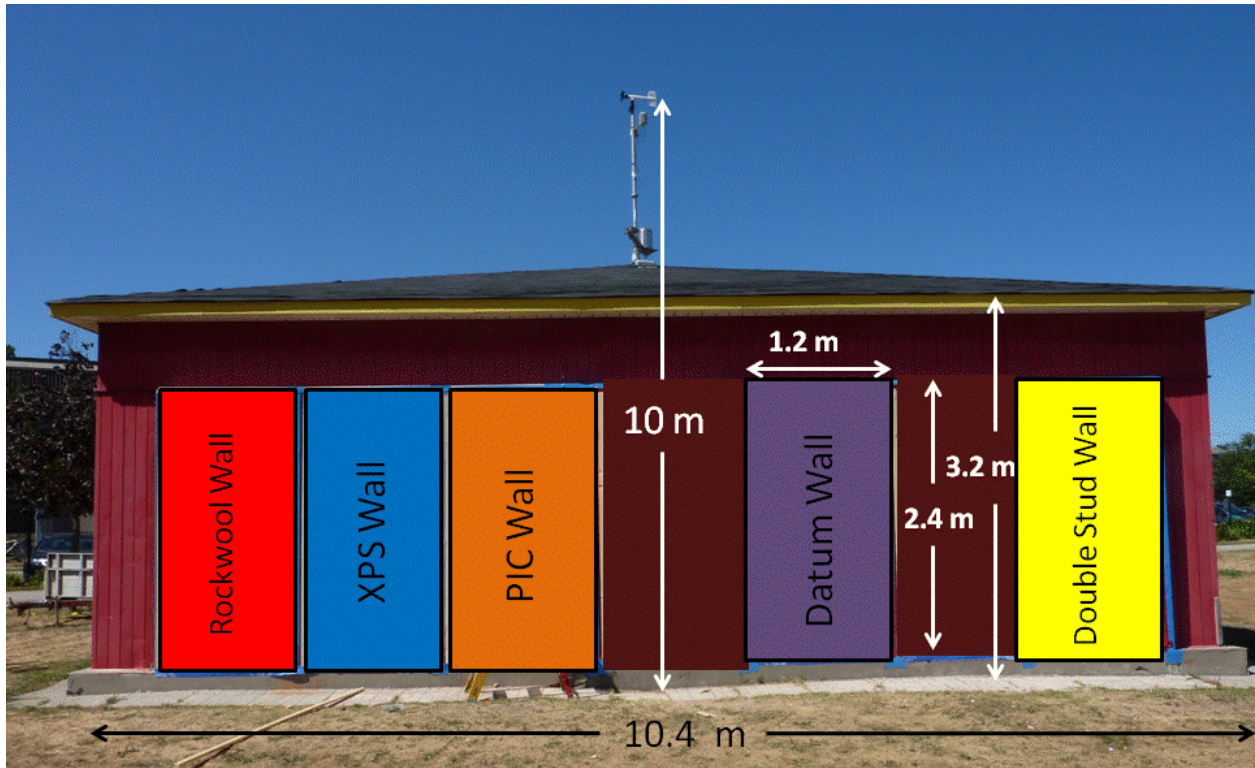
South elevation of BEG hut including test wall locations and dimensions
